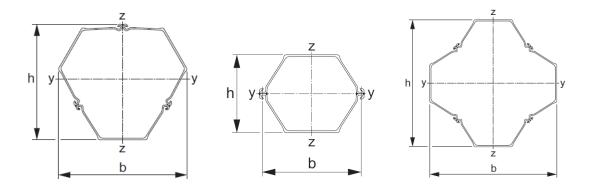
Typical cross-sections of prefabricated welded steel hollow piles [3]
